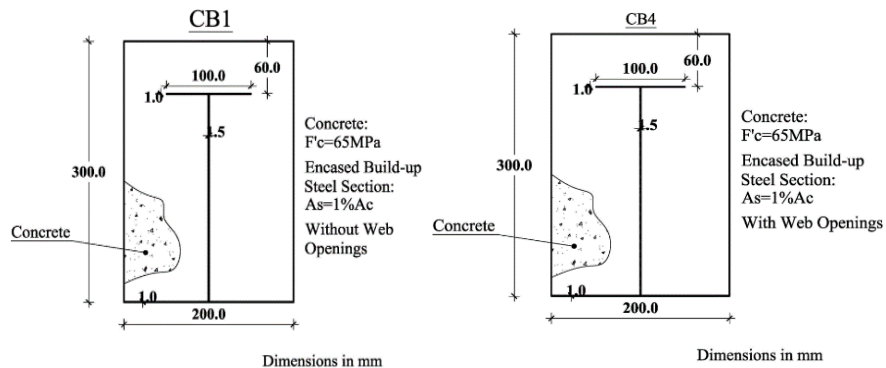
Typical cross-sections of the composite beams with/without web openings.
